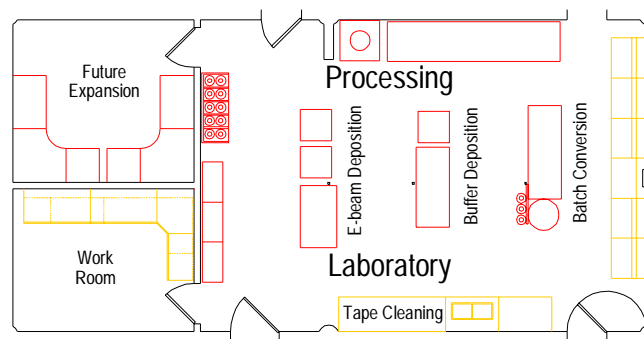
Floor plan of the ACCI Processing Laboratory (~1000 ft²).
